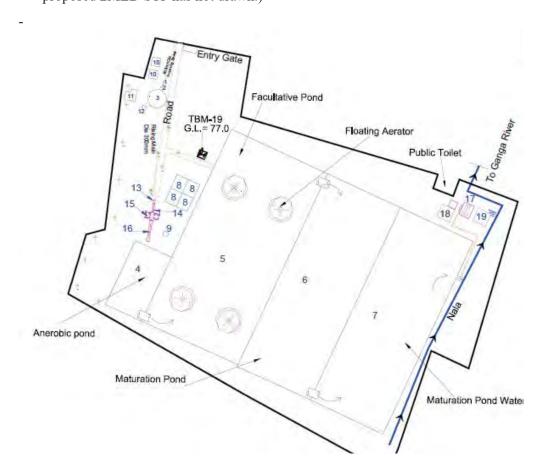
Layout at upgraded Vindhyachal STP (DPR plan)
